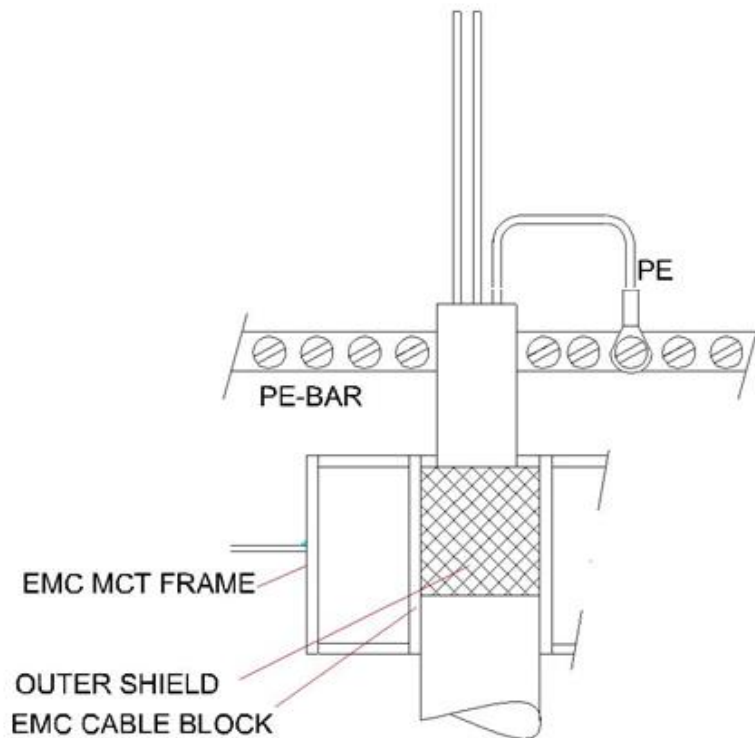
Detail power cable connection EMC –MCT frame entry single shielded cable.
